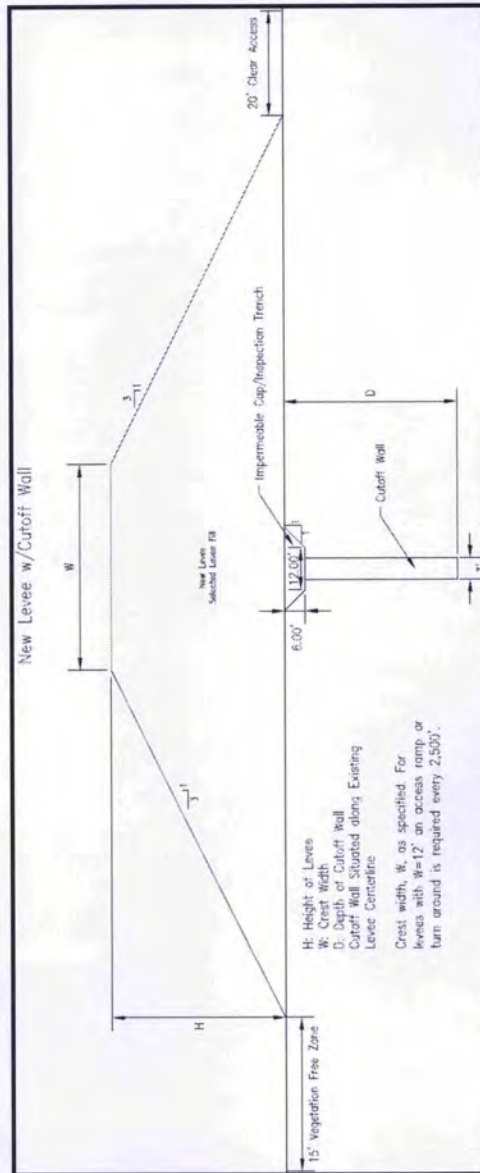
New Levee with Cut-off Wall Typical Plan.
